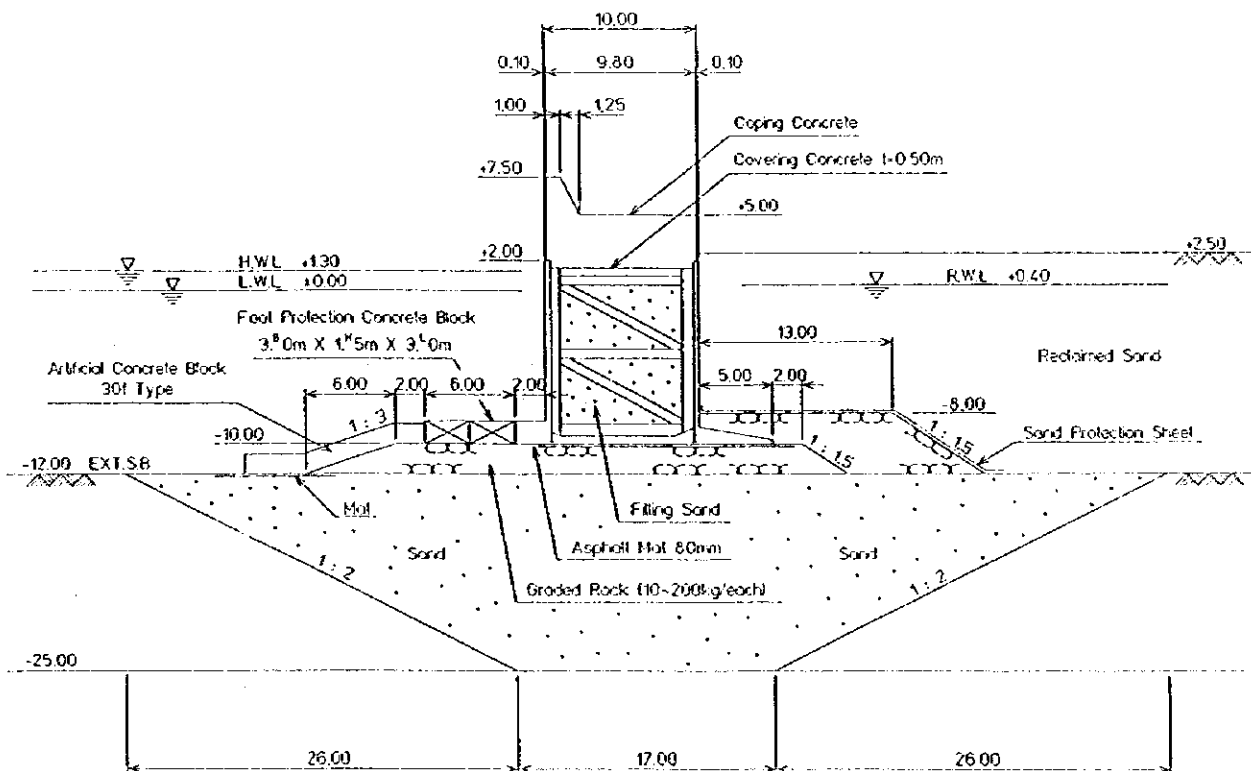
(2) Typical Cross Section of Seawall (Hybrid Caisson)
